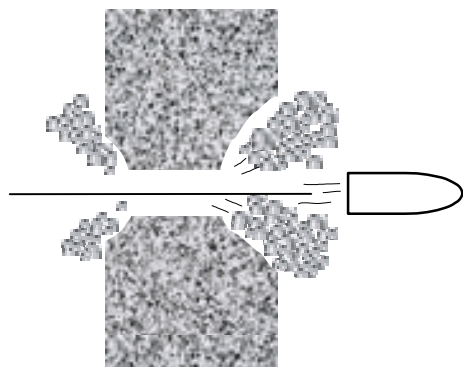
Spalling and scabbing. Spalling on the exposed side of the concrete wall and scabbing on the reverse side of the wall. Based on Engberg and Karevik [5].
